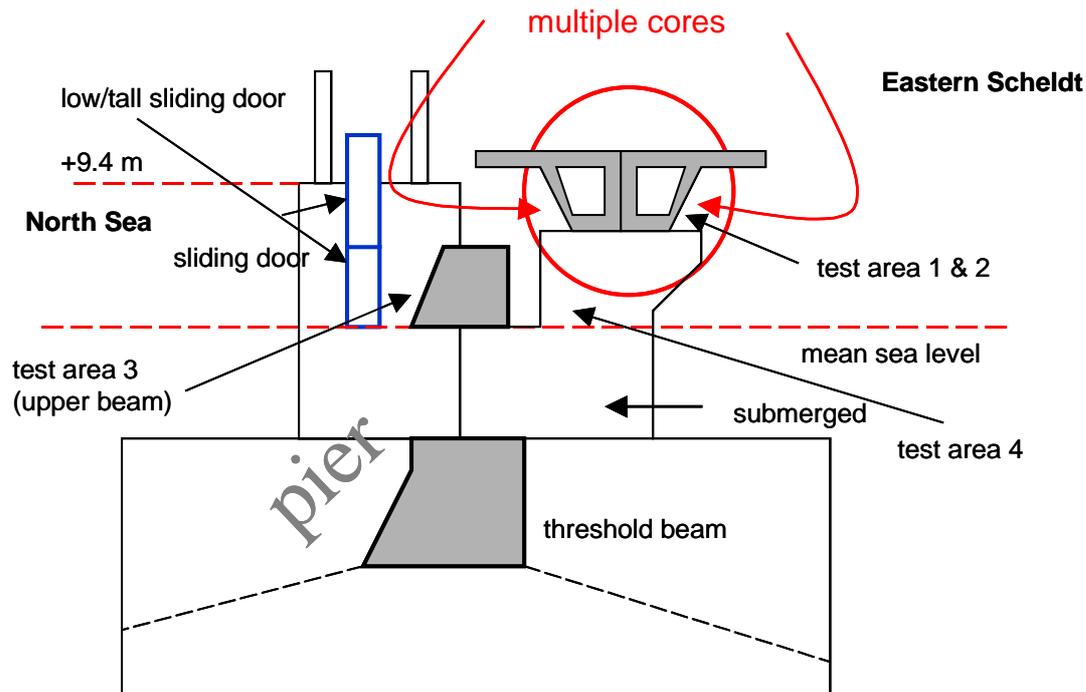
Cross section of pier, beams and bridge element, sliding door (in raised position), test areas and cores
